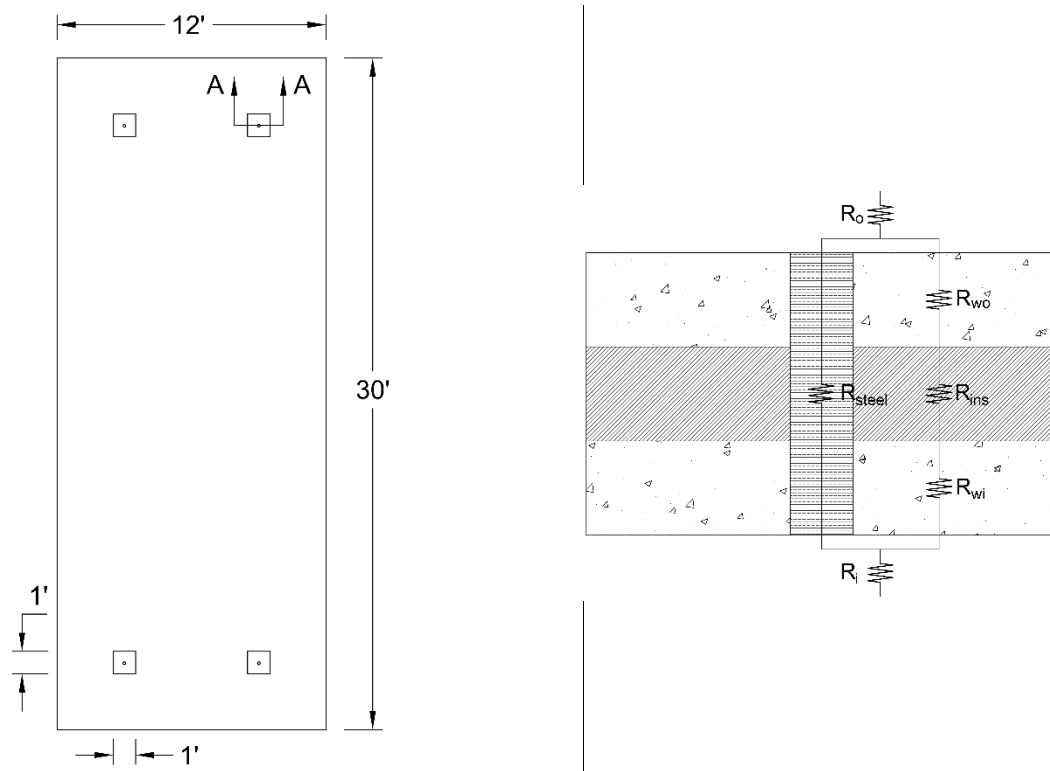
Lifting anchor example panel layout and cross-section with electrical circuit analogy
